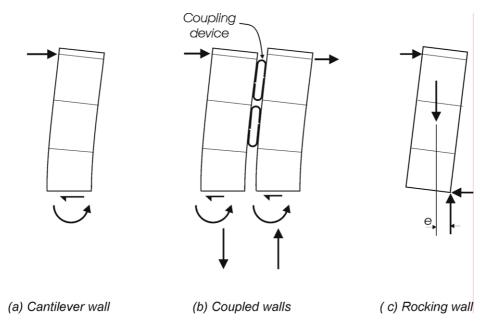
Classification of precast concrete wall systems according to the in-plane lateral force resisting mechanisms
